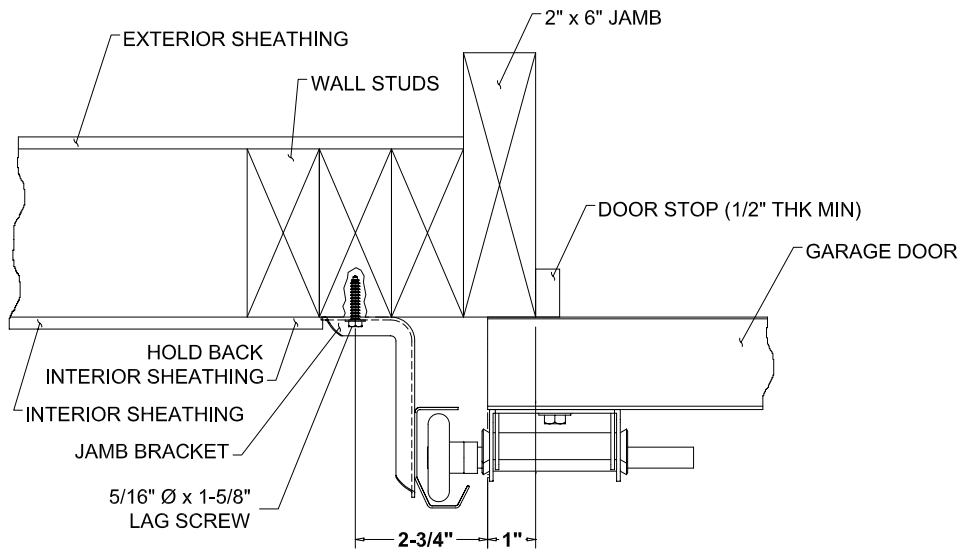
Attachment of Garage Door Brackets Directly to Wood Wall Framing (Option 2)
